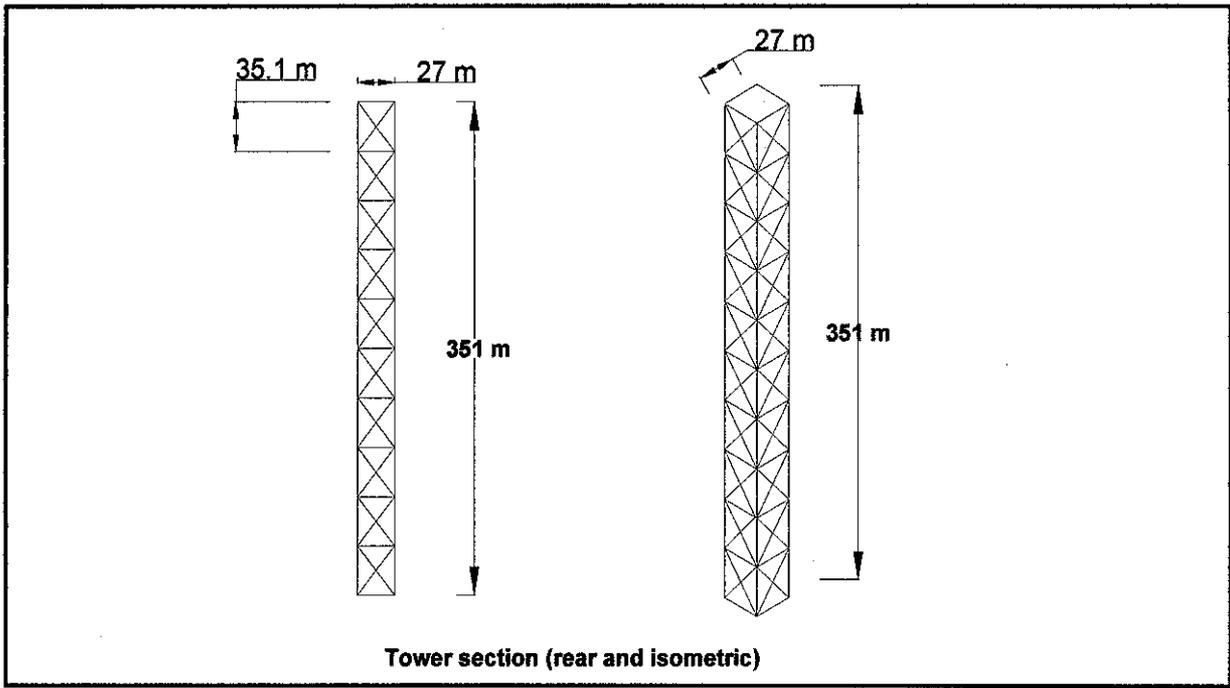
Tower section of Baldpate tower (rear and isometric)
